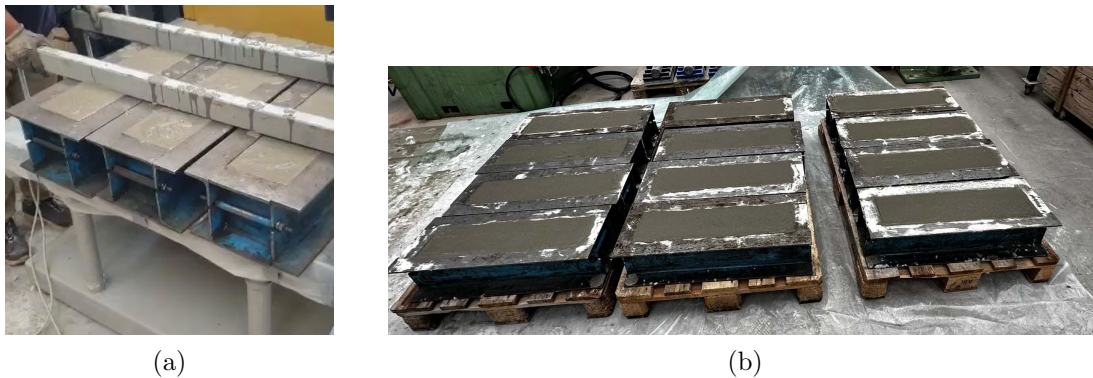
Casting procedure for EN 14651 [7] three-point bending test (3PBT) beams: (a) Beam casting using an external vibrating table; (b) Cast beam specimens.
